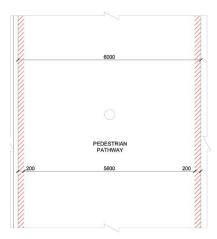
Street width and buffer spaces (in mm) for Gateway 9 in the area surrounding Luisenplatz in Darmstadt Note: Street element (i.e. electric pole with width of 150mm) is included for the calculation of crowding
